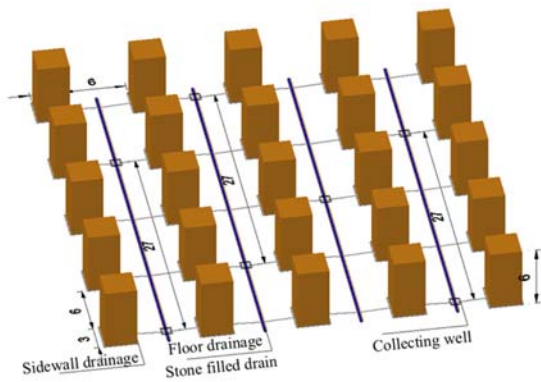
Drainage system using drainage holes at the inside of underground structure
